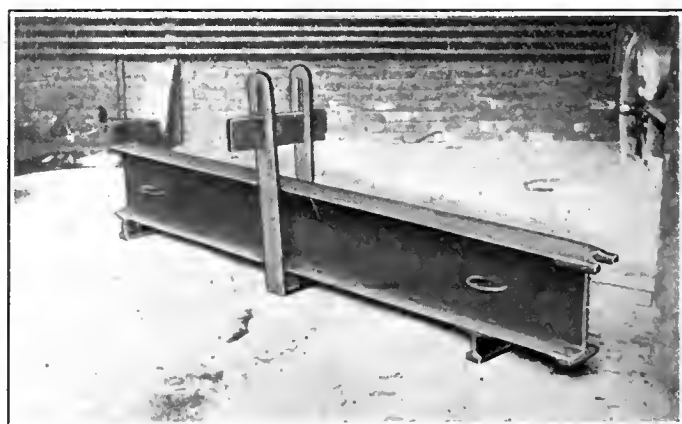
DEVICE FOR REMOVING SURFACE BENDS IN ELECTRIC RAILWAY TRACK
